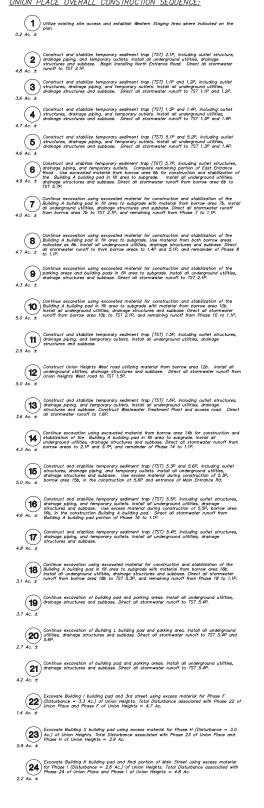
Construction Sequencing Plan Union Place Town of Carmel, Putnam County, New York Source: Insite Engineering, Surveying & Landscape Architecture, P.C.. 2/20/09 Scale: 1" = 550'
